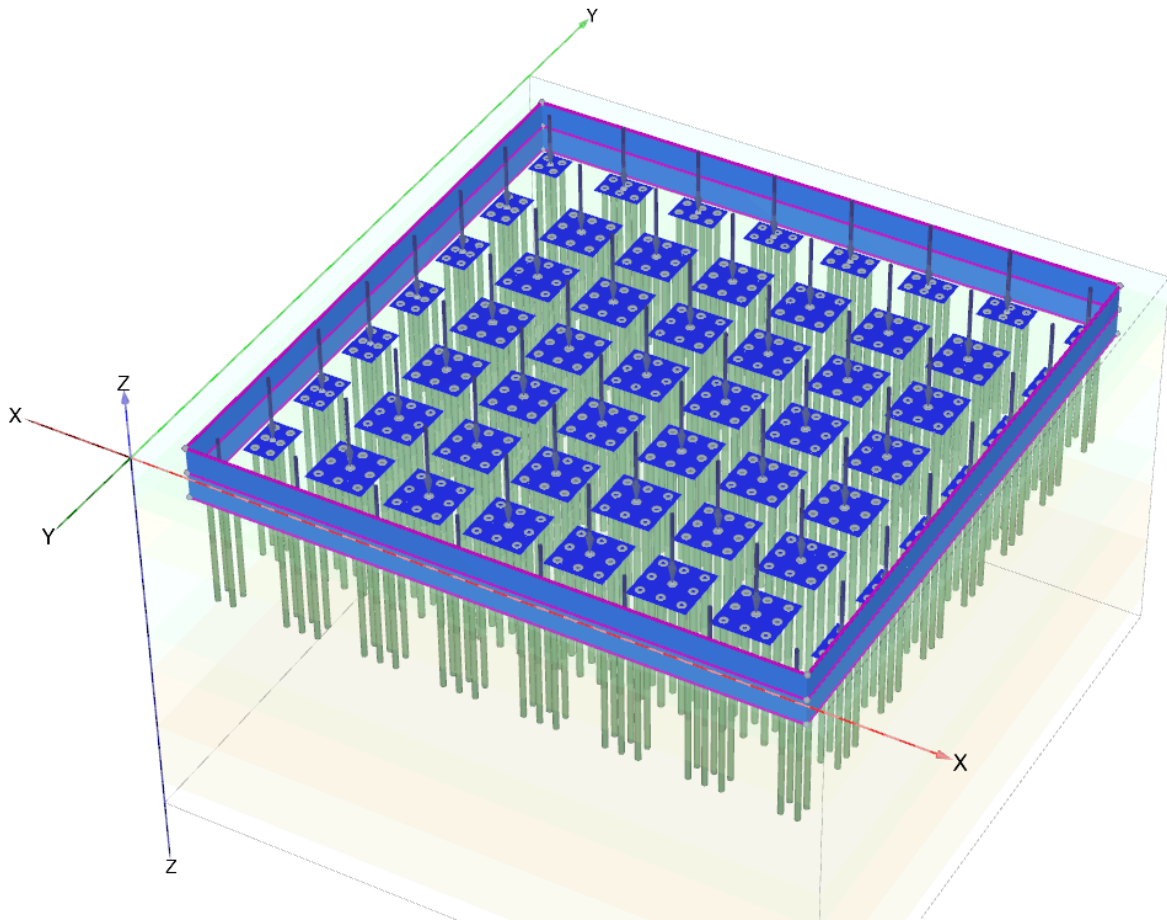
Sheet pile and group pile in Plaxis 3D
